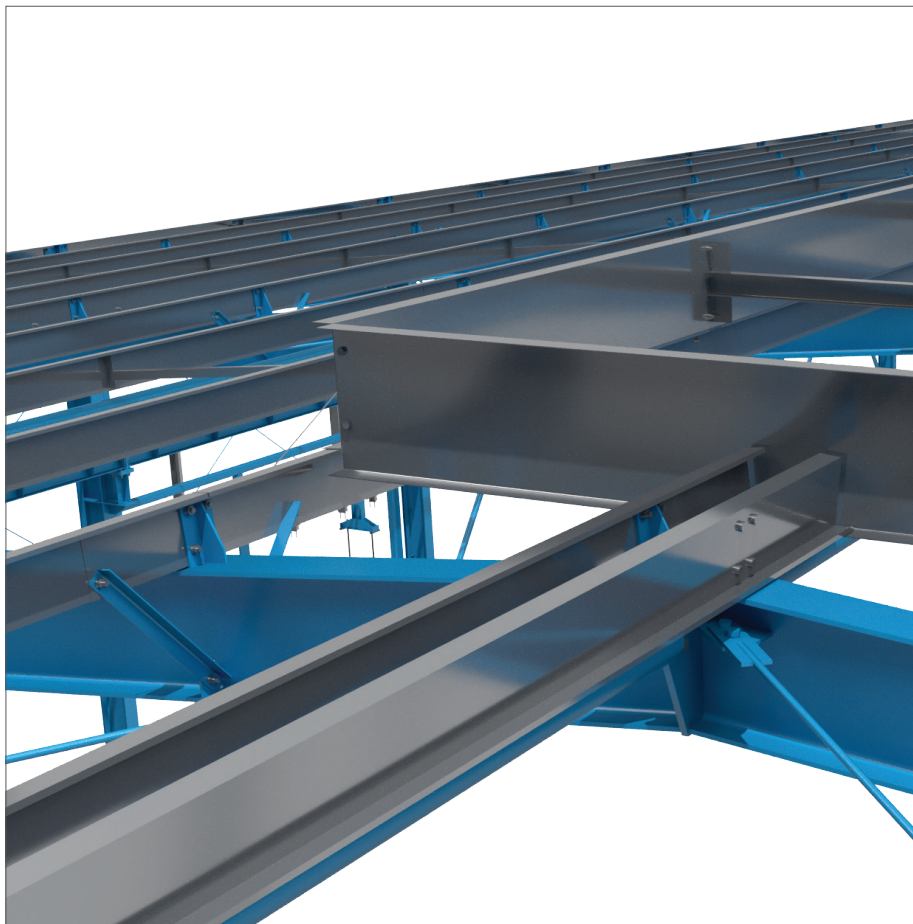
Structural arrangement of a skylight parallel to the purlins
